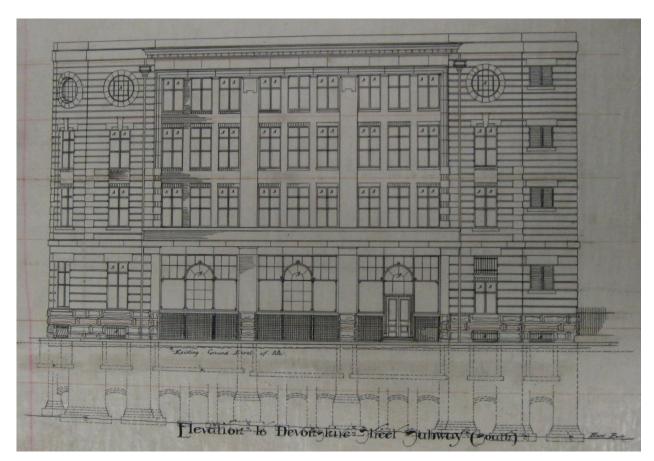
New Parcels Post Office Premises at the Central Railway Station Sydney: Elevation to Devonshire Street Subway (south), 1910.
